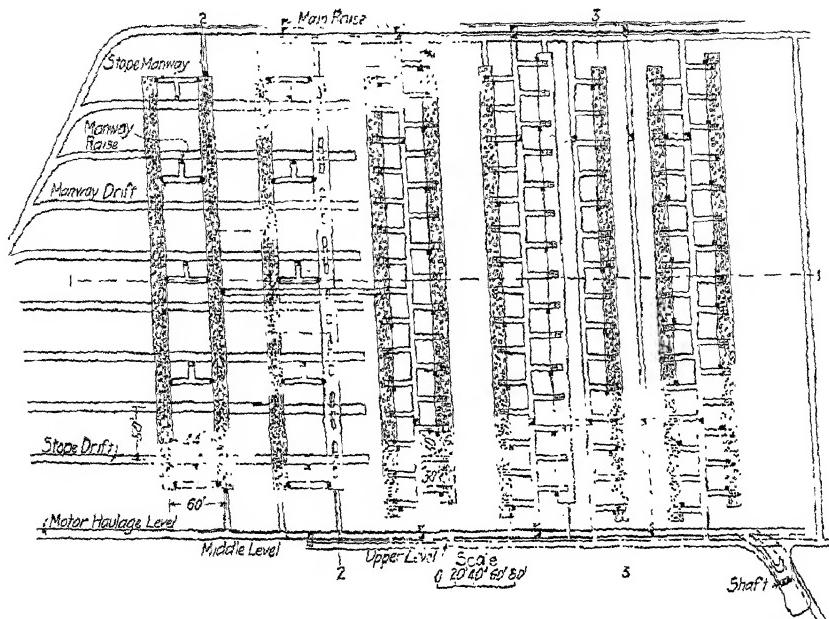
PLAN OF WORKINGS FOR ONE BLOCK OF STOPEs.
